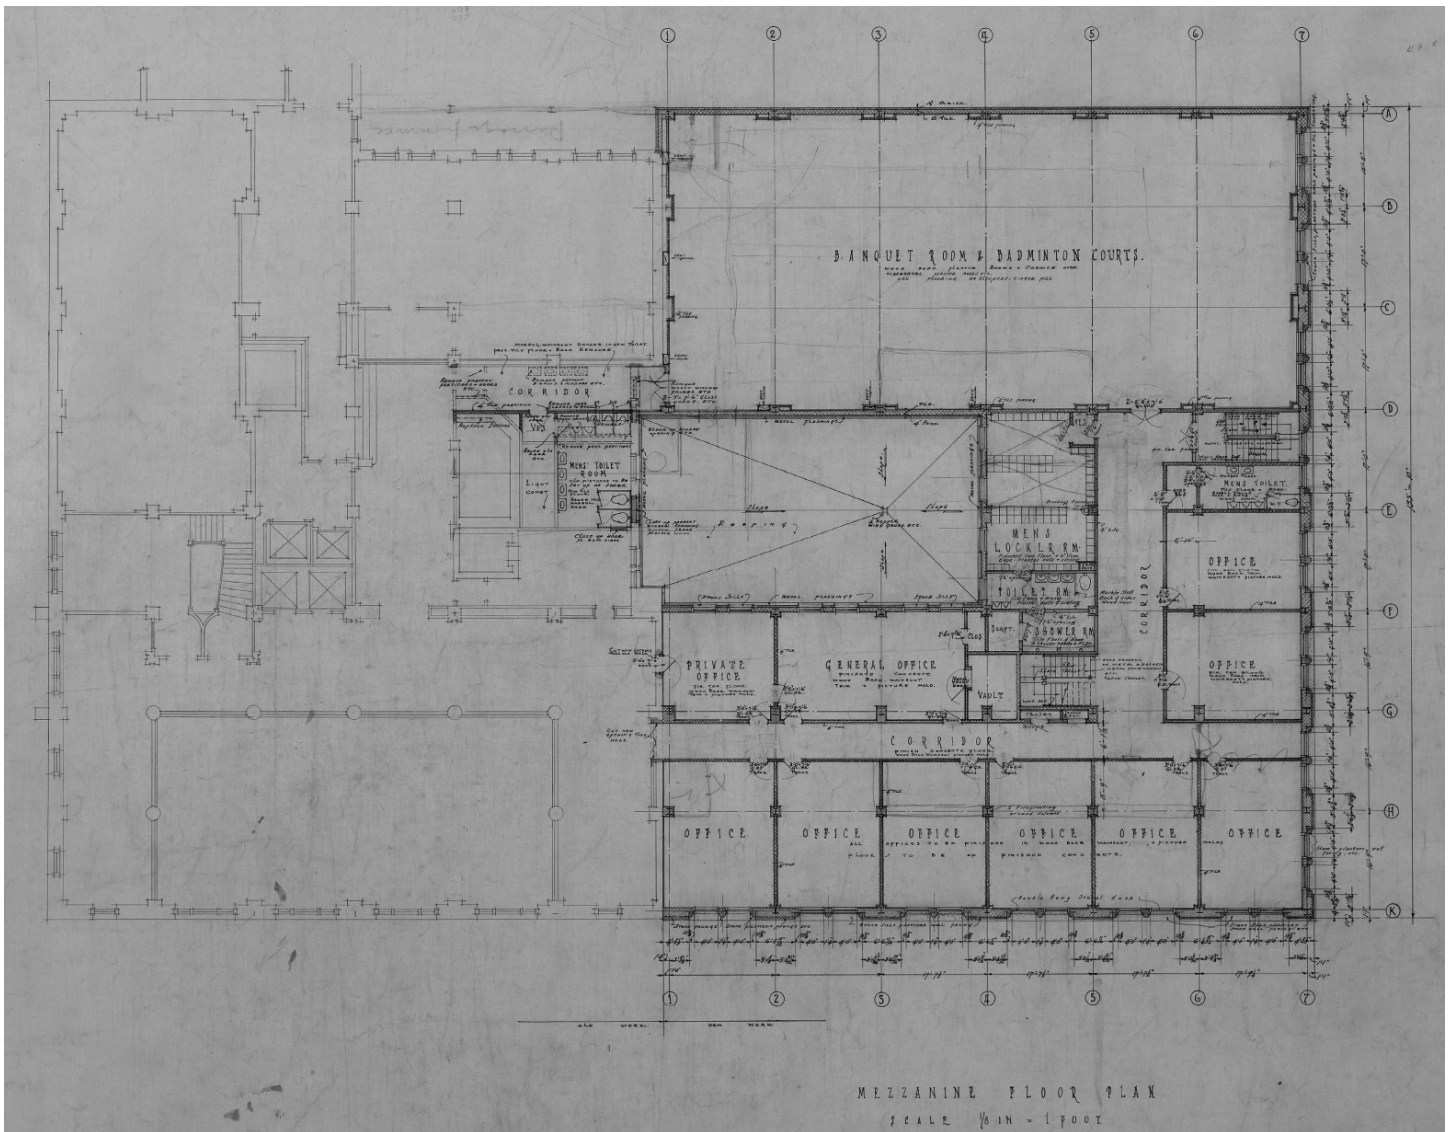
Hutton & Souter, Architects, "Plans of Alterations and Additions for Royal Connaught Hotel Hamilton," 27 Apr. 1931, Souter, Bell, Howard and Souter Fonds, Archives of Ontario, C12-1-0-458, Container # L-717, Barcode B732587, Drawing No. 3 – Mezzanine Floor Plan.
